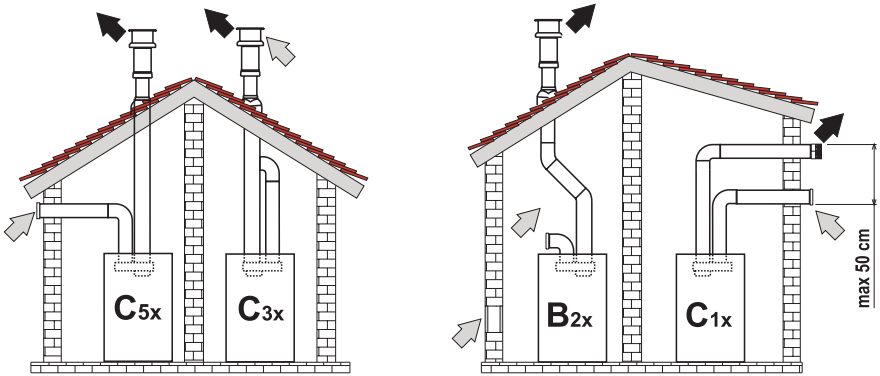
Examples of connection with separate pipes (➡ = Air / ➡ = Fumes)
